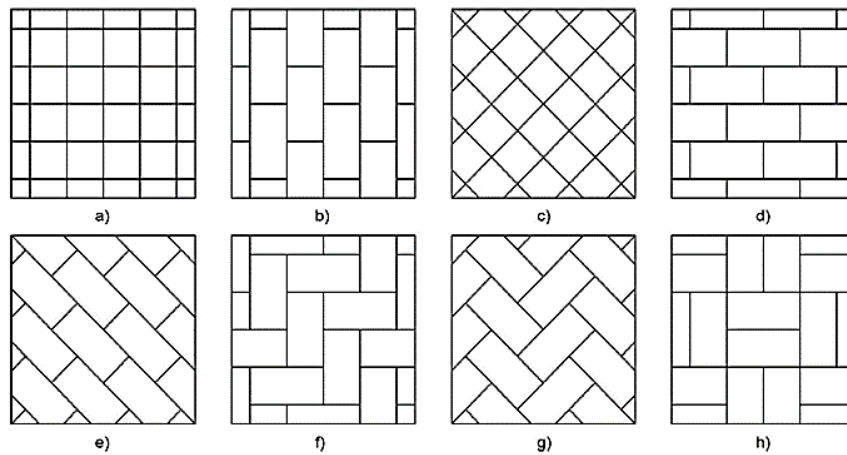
Typical laying patterns used in ICP, a) stacked bond b) stretcher bond 90° or running bond, c) stacked bond 45° d) stretcher bond e) stretcher bond 45° f) herringbone 90° g) herringbone 45° and h) basketweave bond (Garilli et al. 2020).
